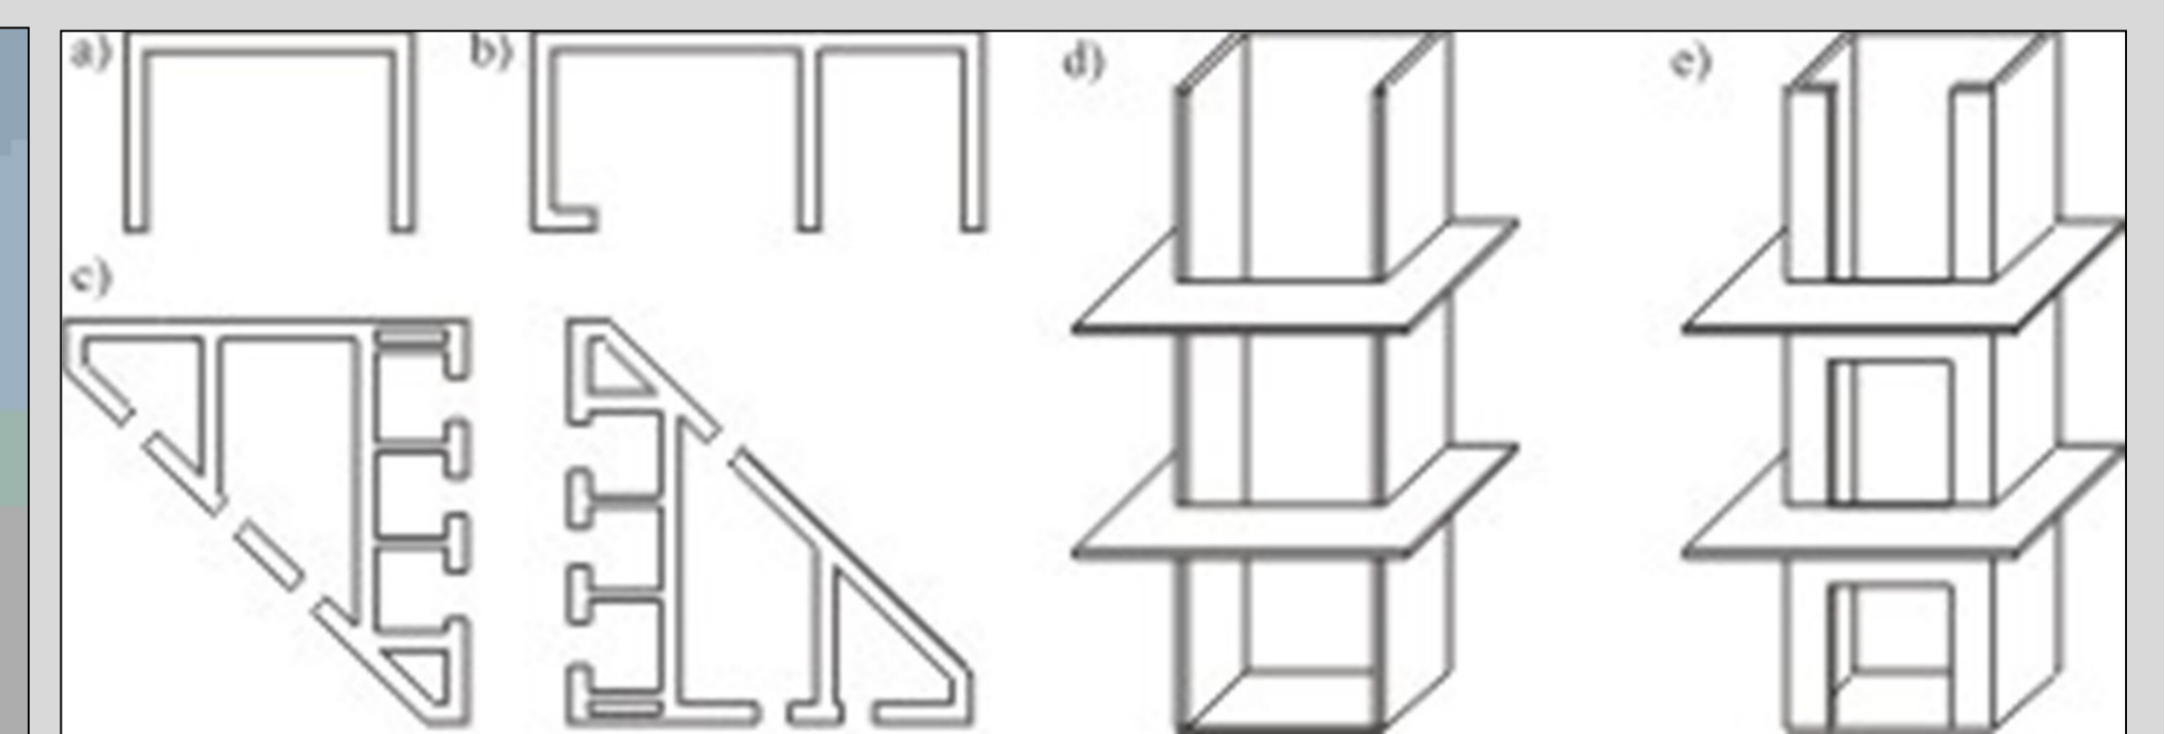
Cross section of core structures(a-c) and examples of an open(d) and partially closed core (e). Cross section (a) U-shaped wall = the most simple type of core wall (R.3.)
